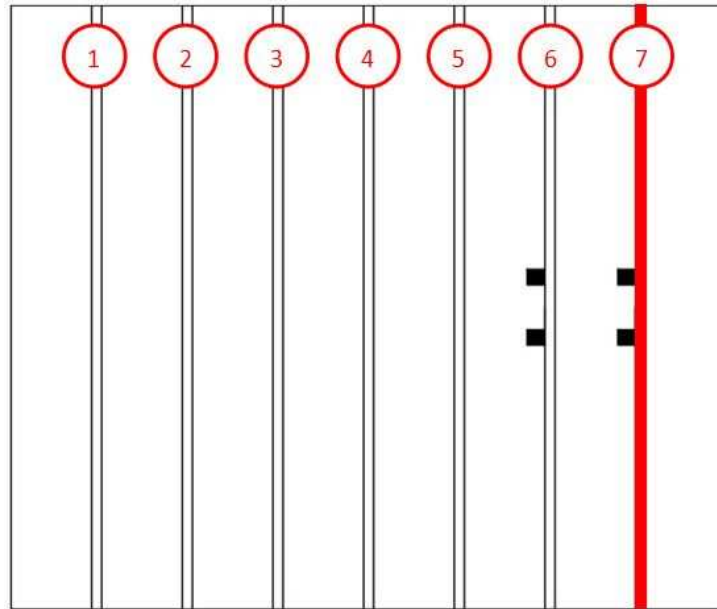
Critical load location for shear for a six-foot section NEXT-D bridge
